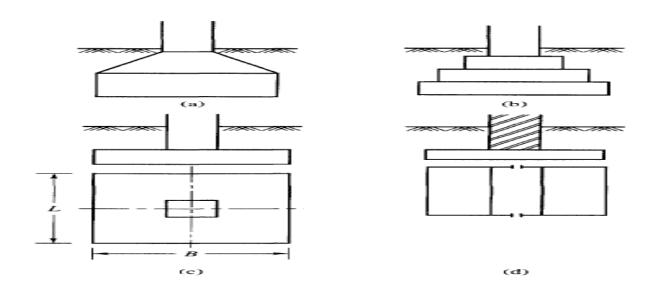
Types of shallow foundations: (a) plain concrete foundation, (b) stepped reinforced concrete foundation, (c) reinforced concrete rectangular foundation, and (d) reinforced concrete wall foundation.
